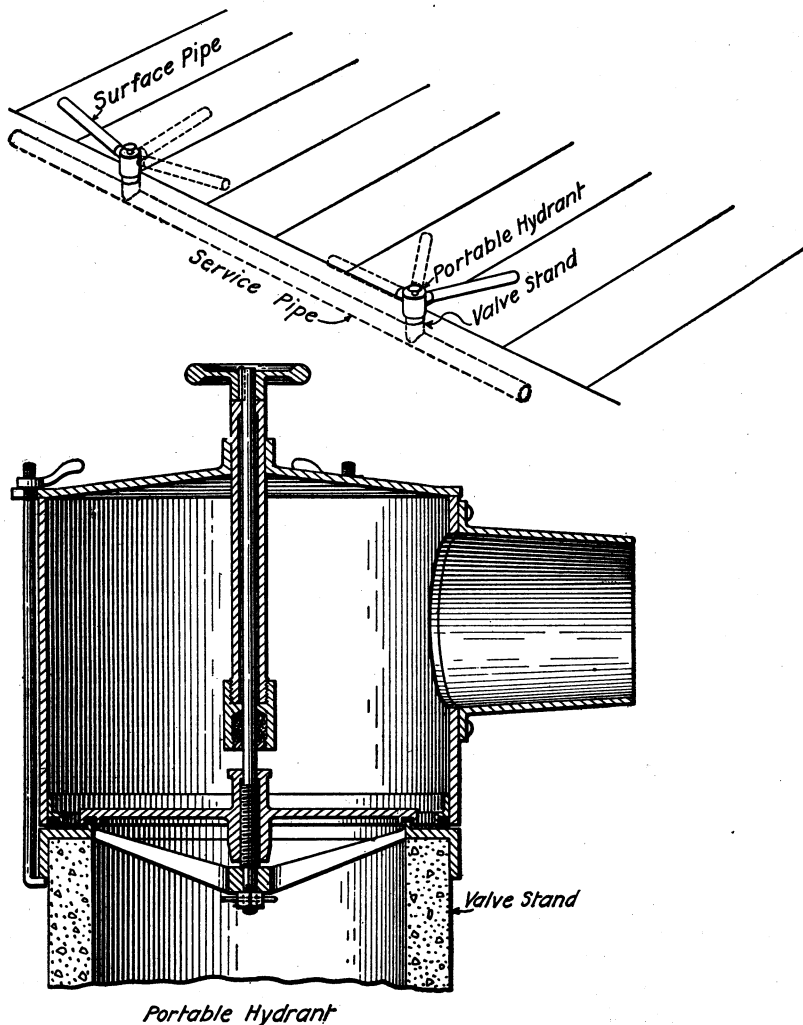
Portable hydrant attached to valve shown in Figure 9, service pipe, surface pipe and borders
